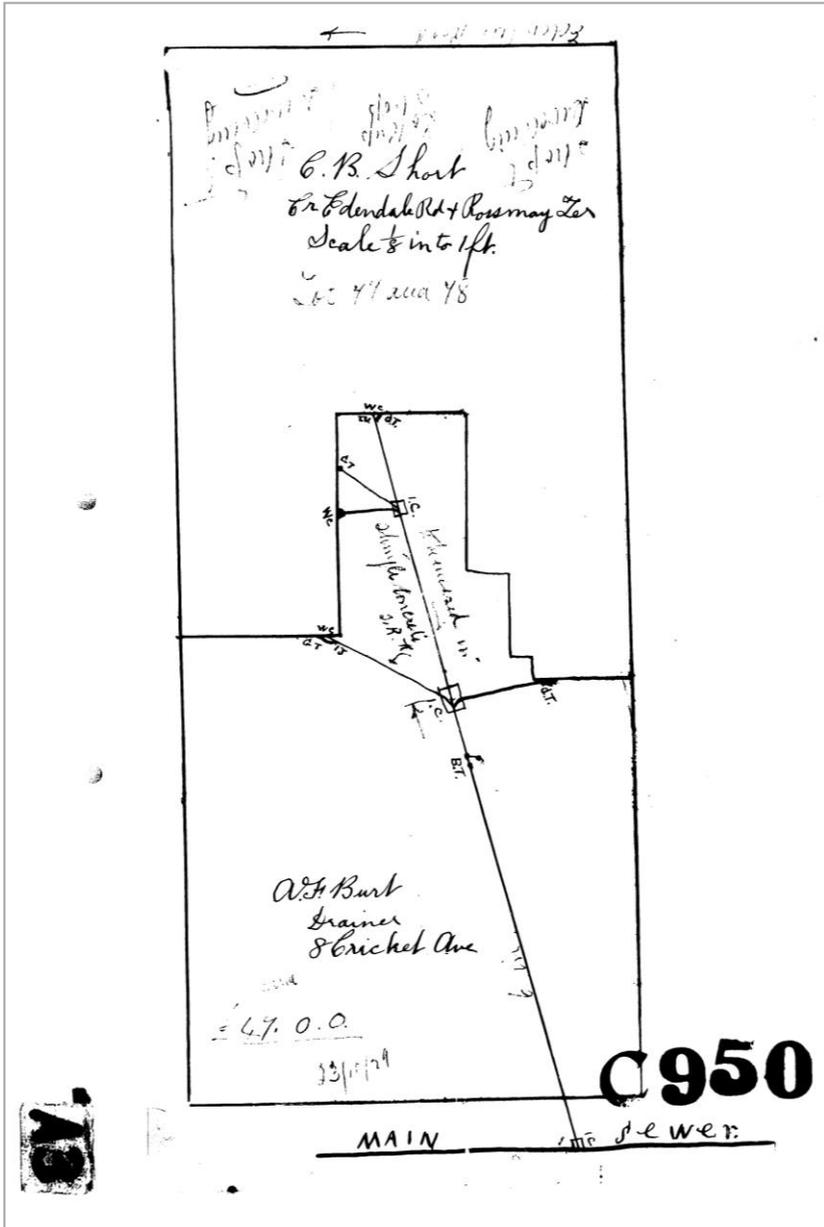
The 1929 drainage plan for Rugby Buildings. Source: Auckland Council
